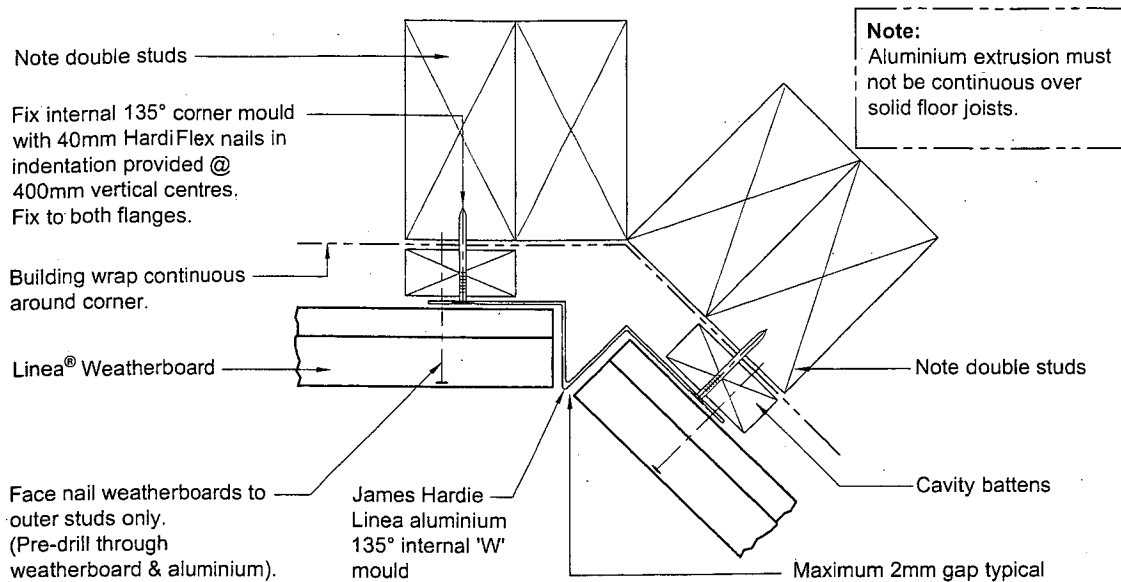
CAVITY INTERNAL 135° ALUMINIUM 'W' MOULD CORNER
